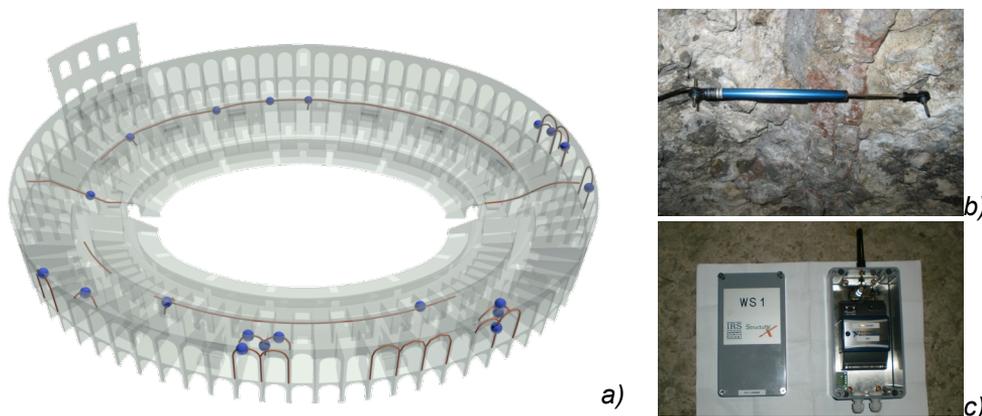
Static system: a) Layout and sensors positions; b) displacement transducer on a crack and c) wireless node.
